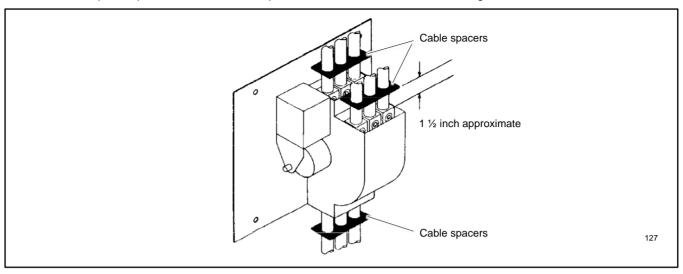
Cable Spacers for 70-225 KUS Amp Switches
